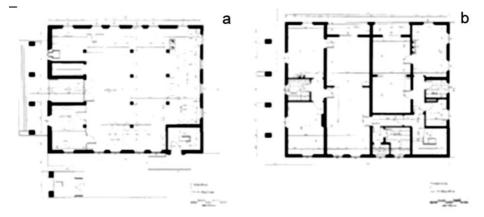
Plans of Silivri branch building (provided from Silivri municipality).
